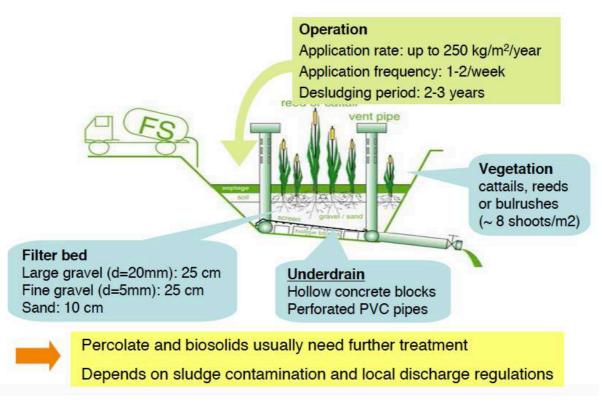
Planted sludge drying bed (EAWAG, 2006)
